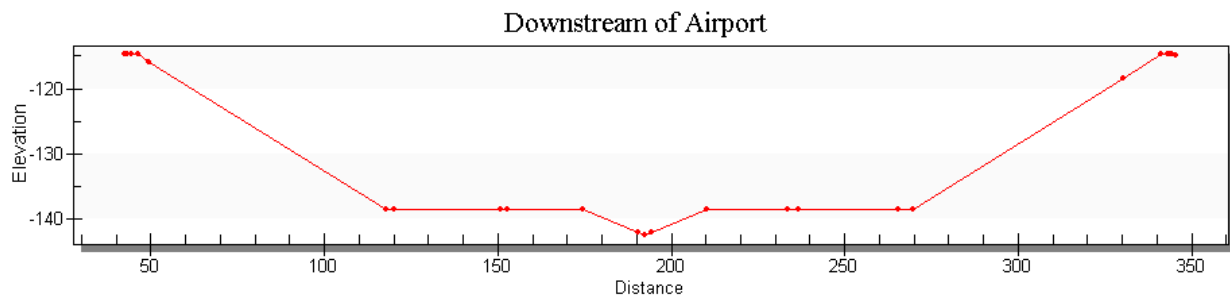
Section view of the improved channel between the Airport and UPRR crossings
